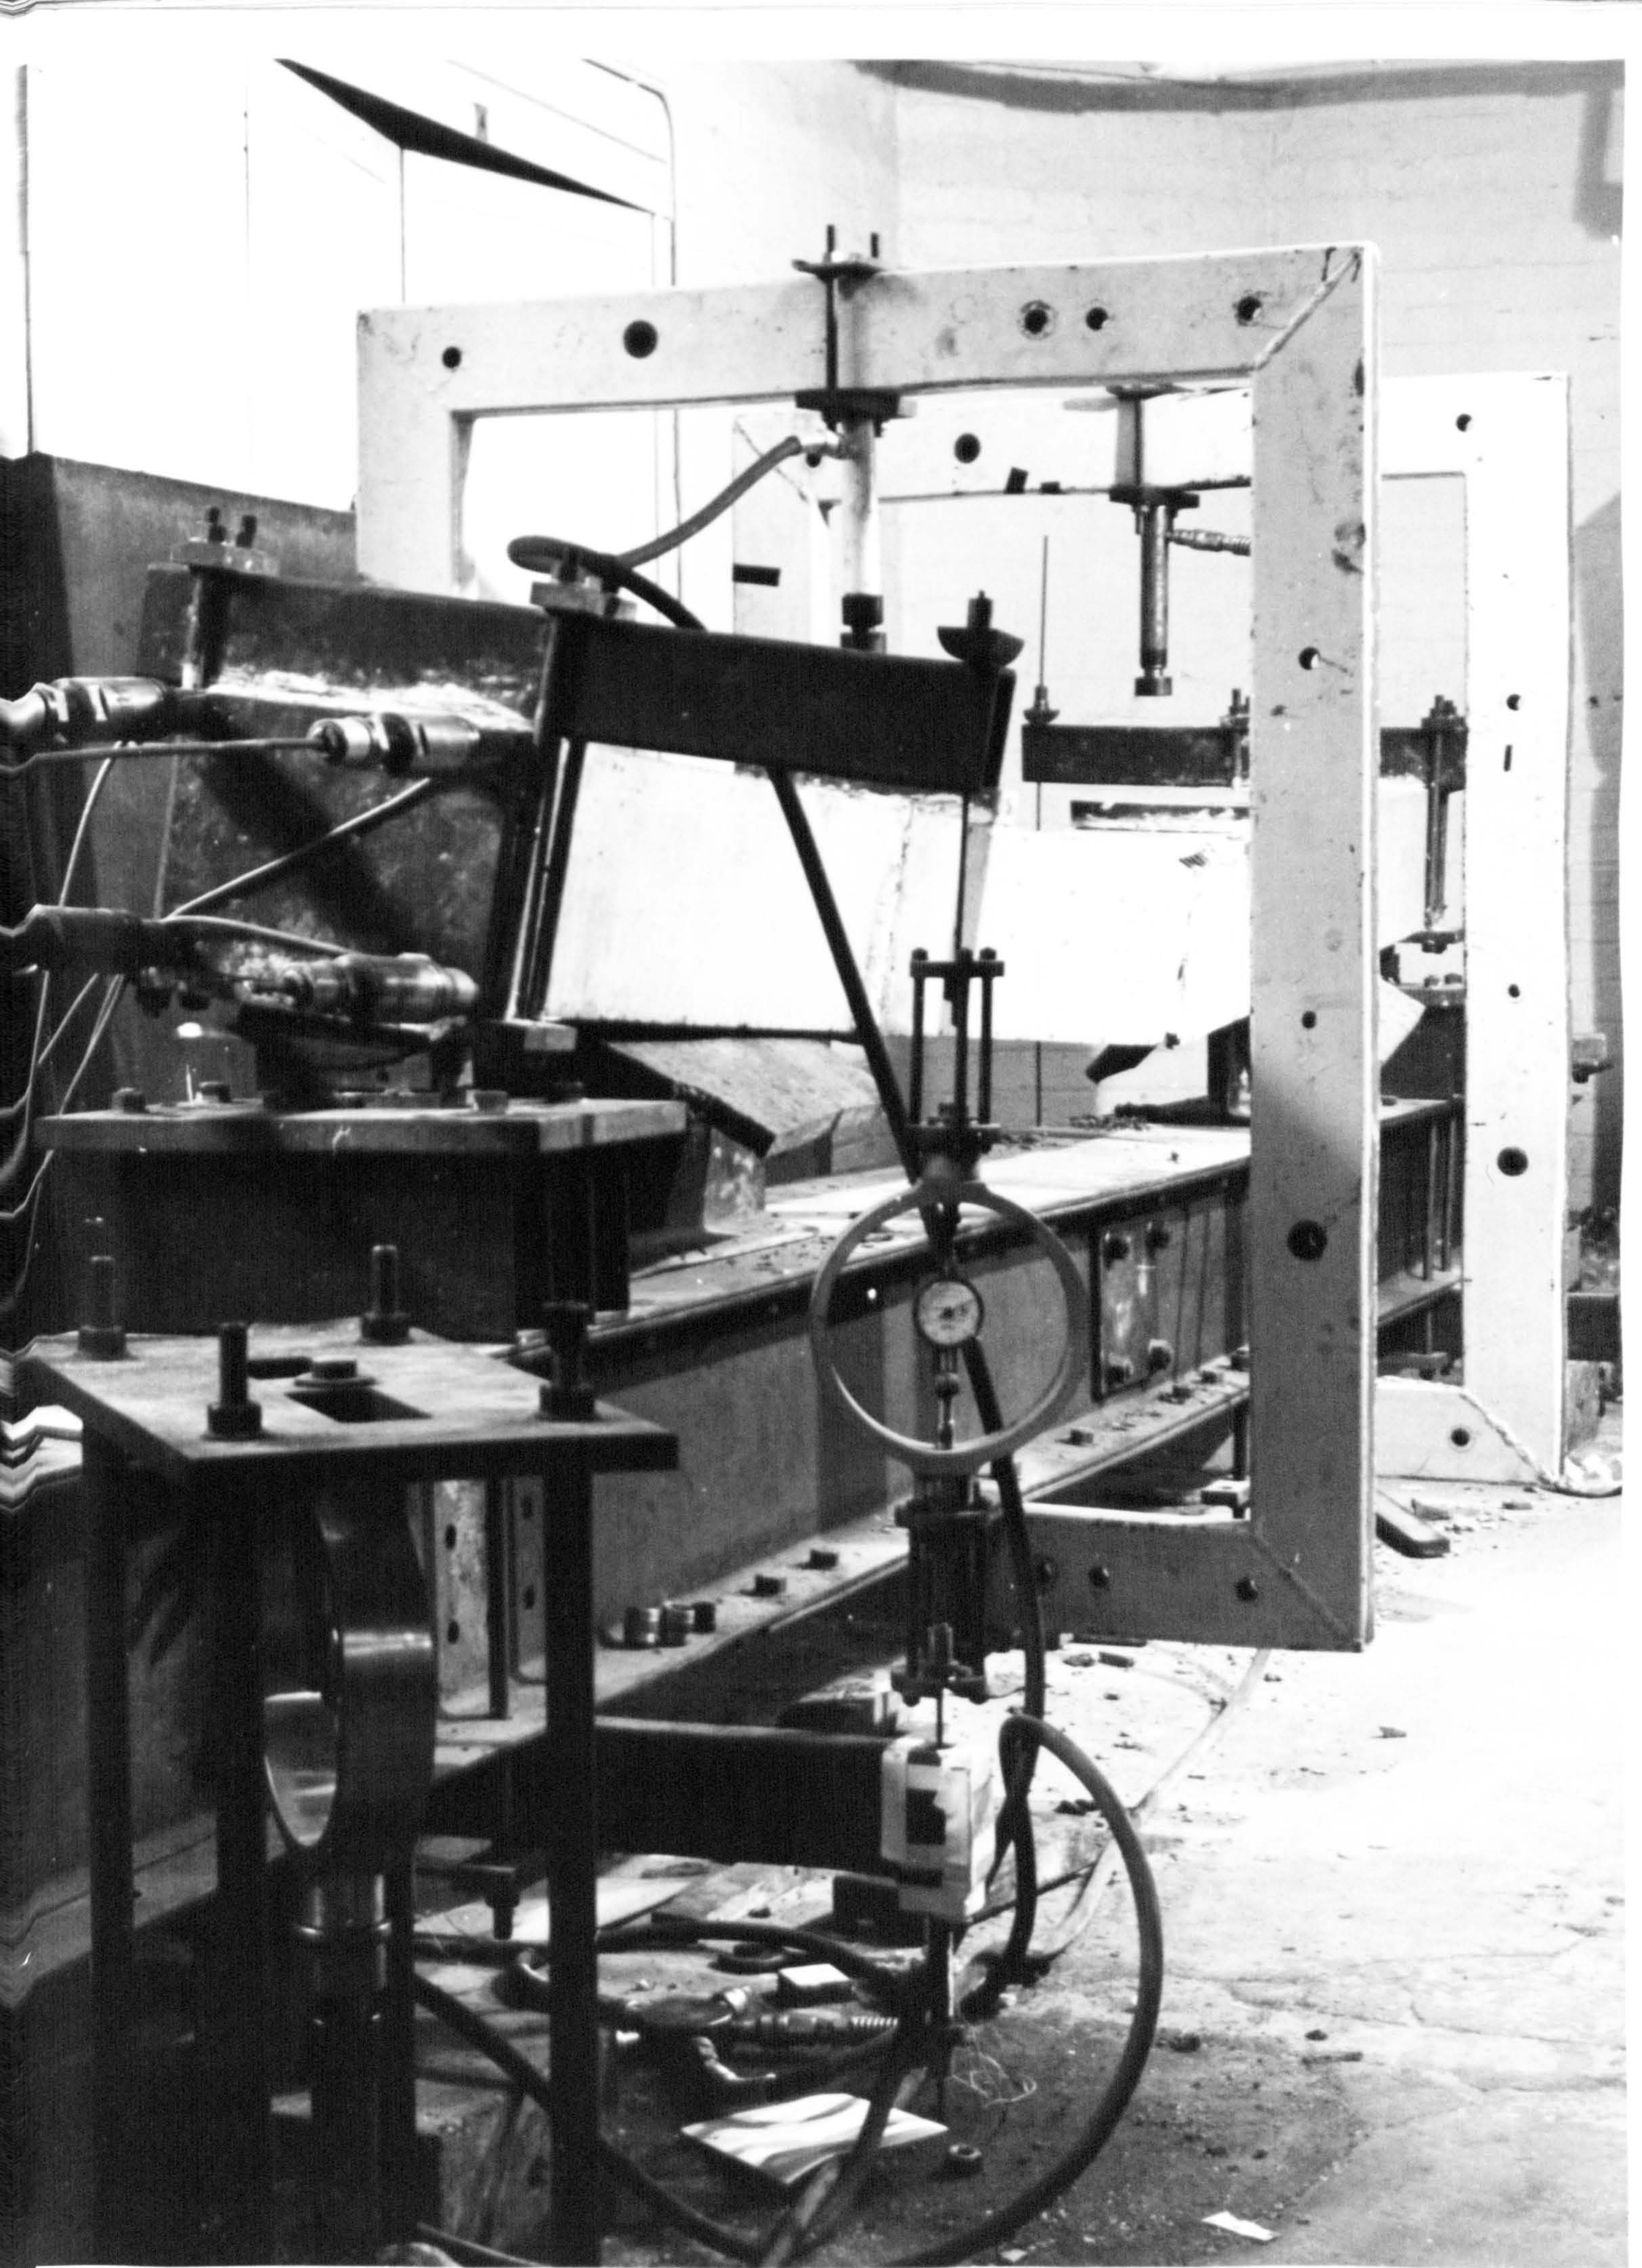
Test Arrangement used for Beams of Series 1 & 4
